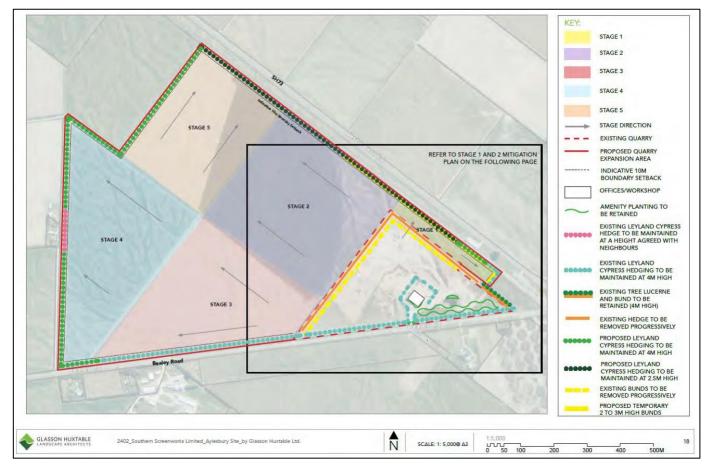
Proposed Landscape Mitigation Plan (Source: AEE)
